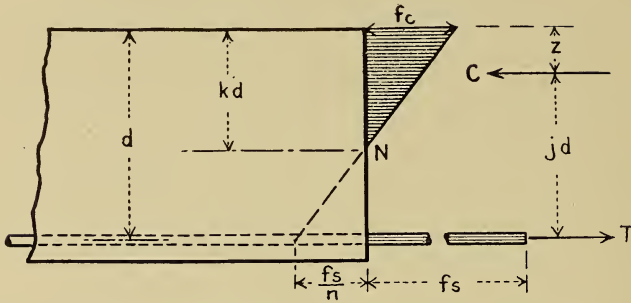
Nomenclature for Concrete Beam Reinforced for Tension.
